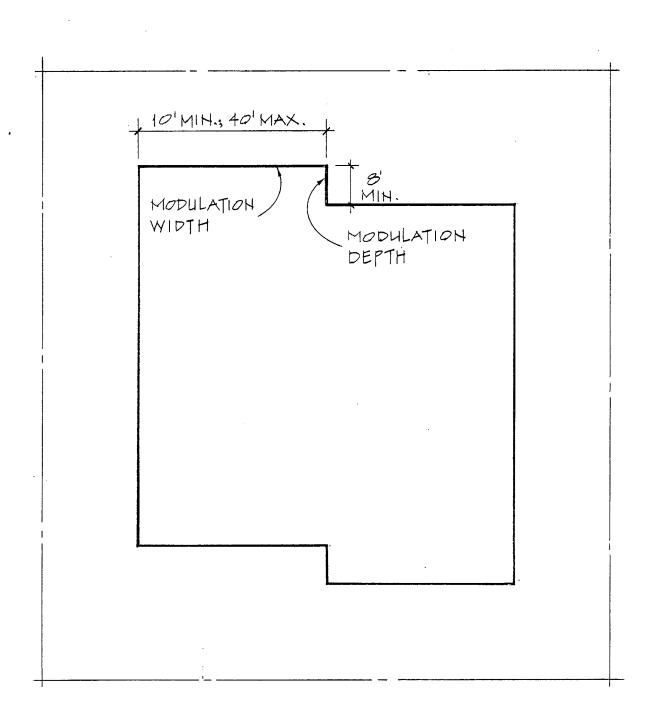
MIDRISE, REQUIRED WIDTH AND DEPTH OF MODULATION
